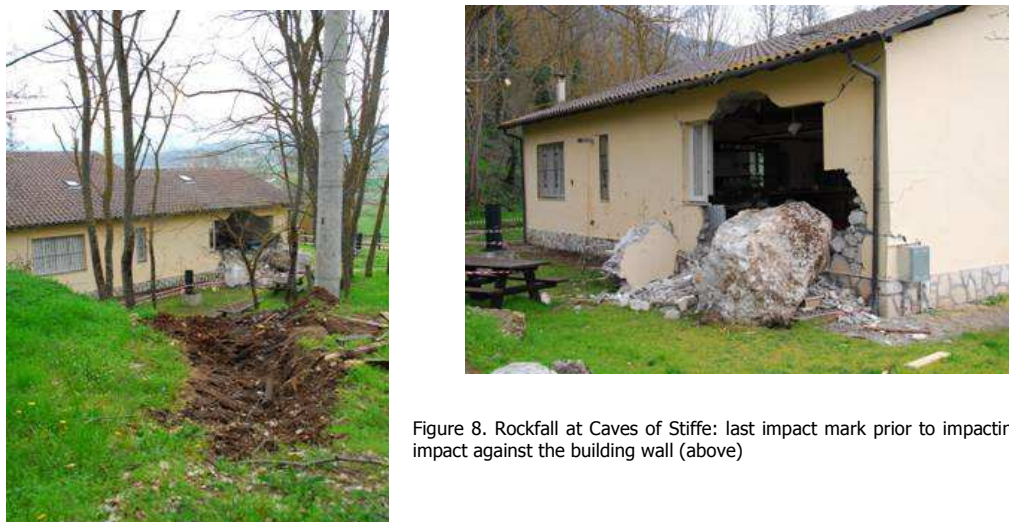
Rockfall at Caves of Stiffe: last impact mark prior to impacting the building (left); the rock fall impact against the building wall (above)
